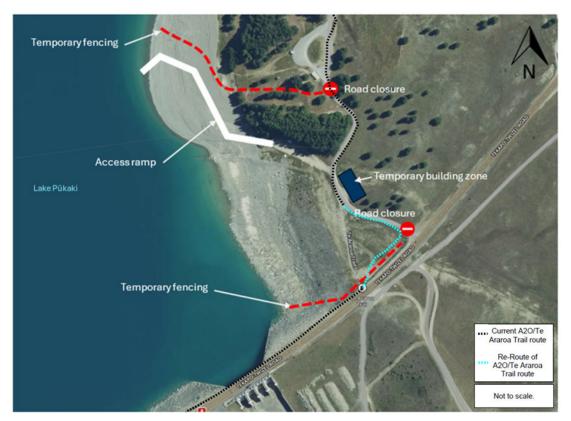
Left abutment - security fencing, closed access, access ramp and proposed re-route
